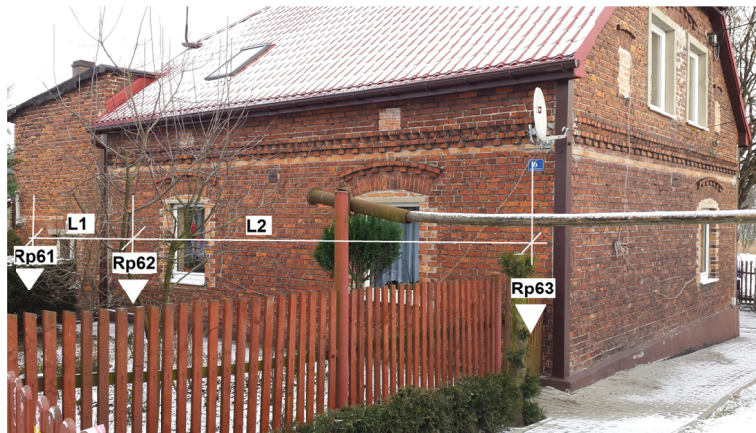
West wall of the building at 6 Świerkowa St. (Source: own elaboration)
